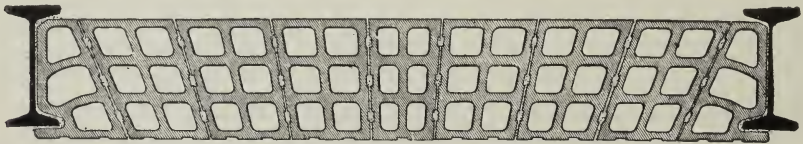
Flat Tile Floor Arch. Ribbed Side-construction.
